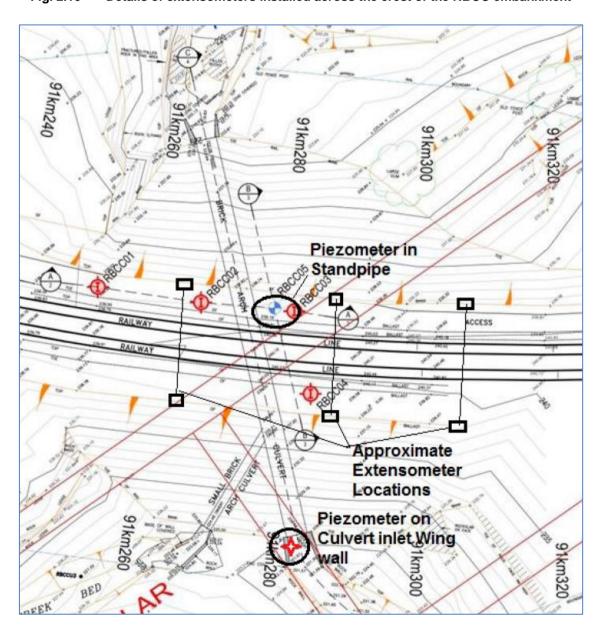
Locations of crest extensometers and piezometers at RBCC embankment
